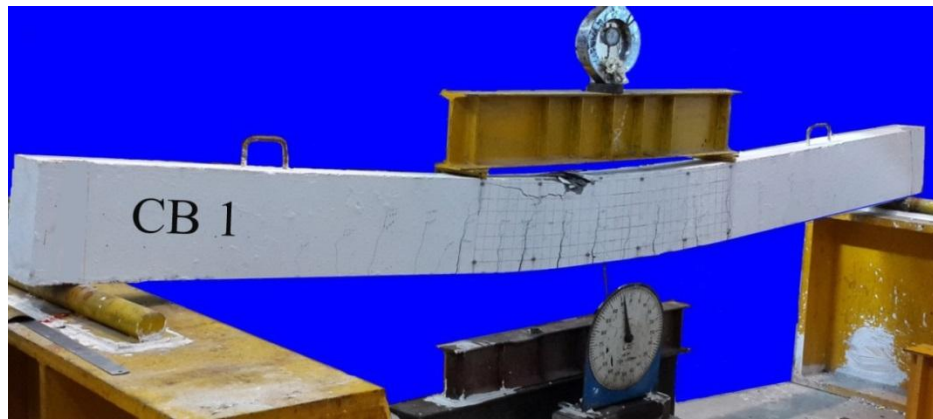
Failure of Beam at Ultimate Load (CB1)
